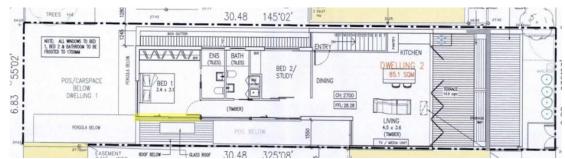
Yellow highlight showing location of west-facing habitable room windows at first floor of No. 108 Queens Parade (PLN11/0937 Endorsed Plans)
